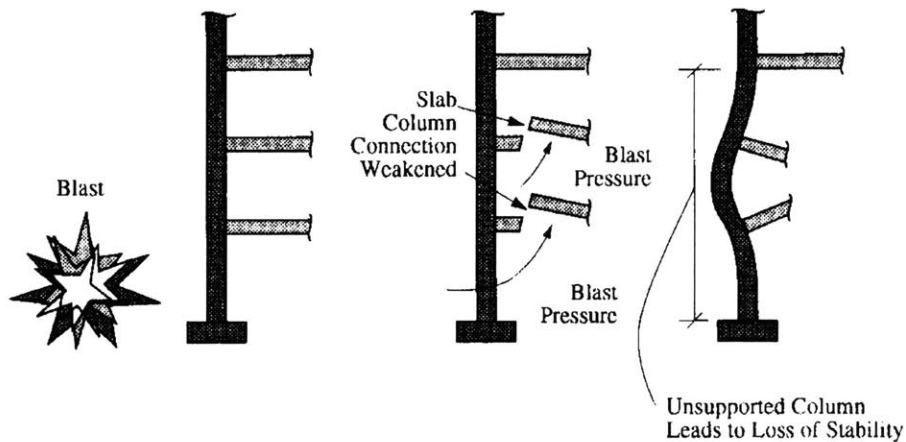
Column Stability Loss from Blast (Ettouney et al)
